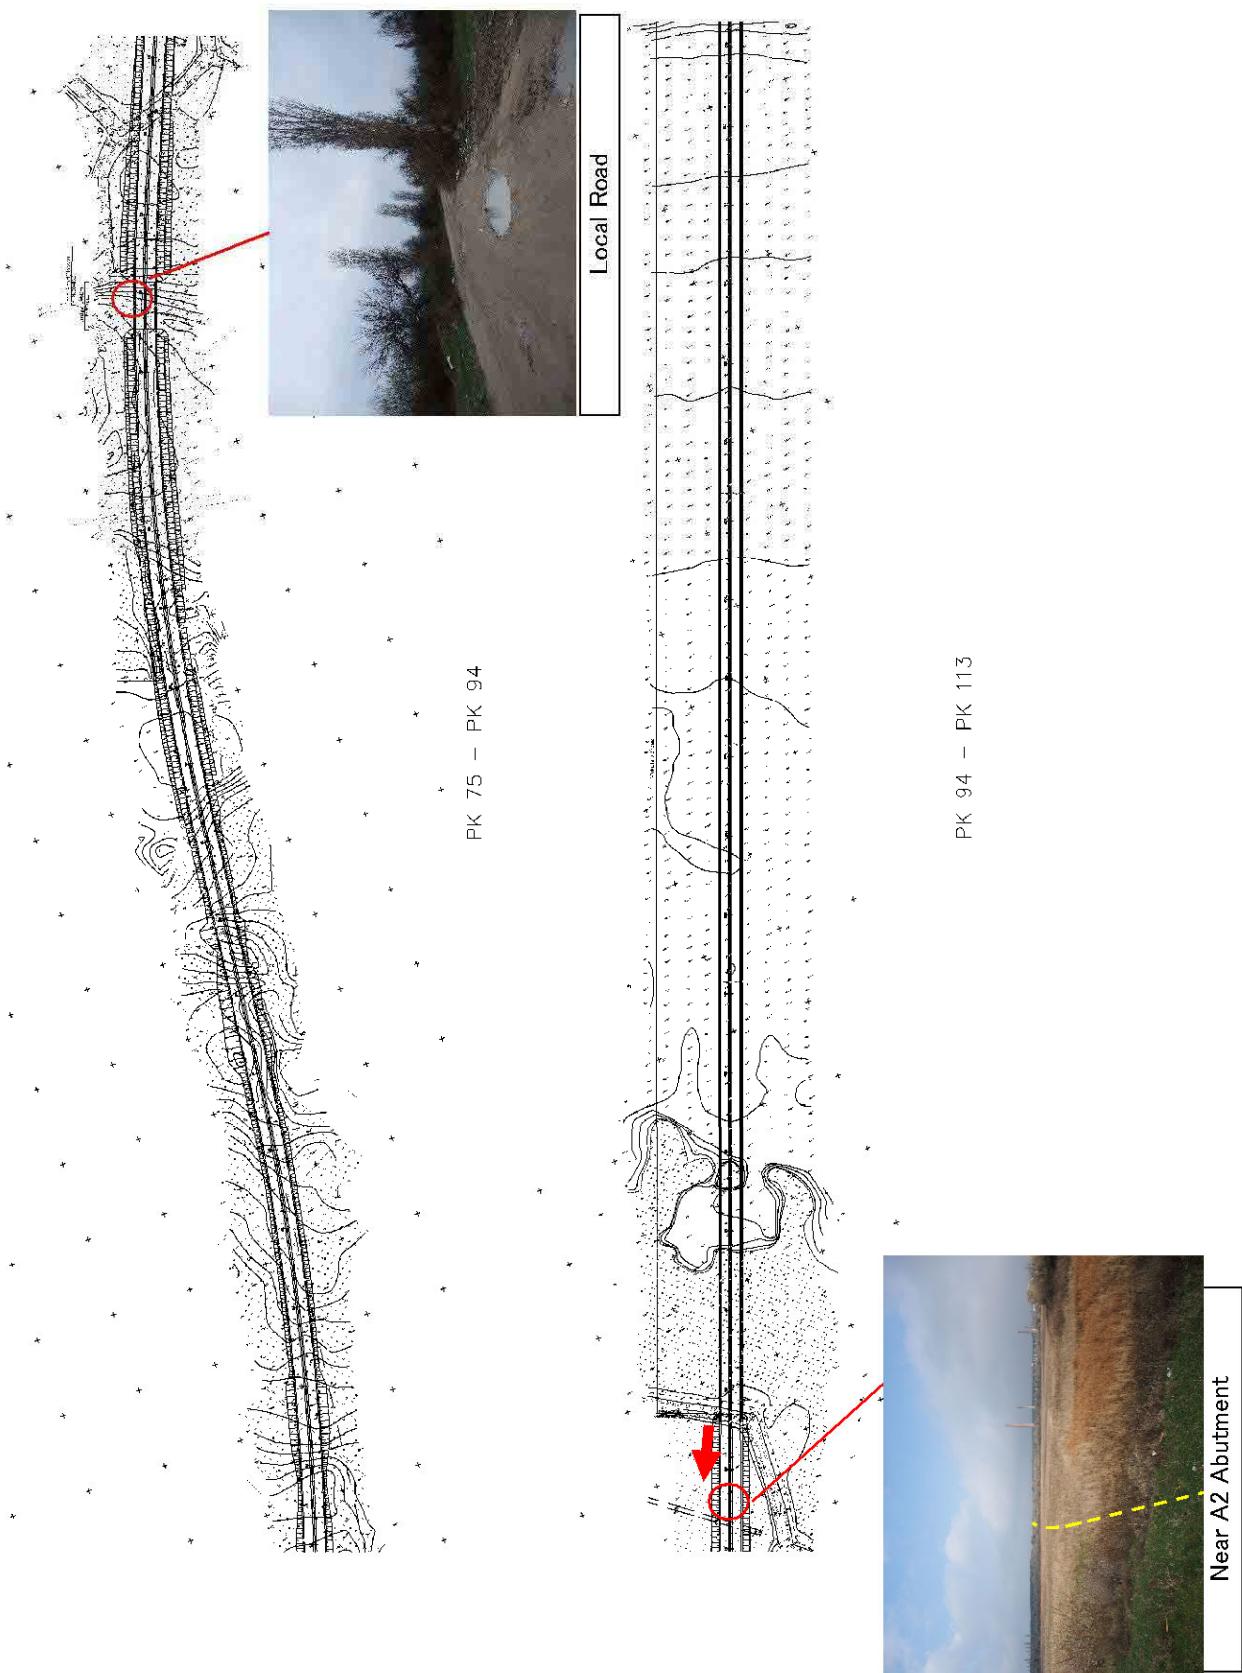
Current Site Condition of M-14 Bypass Road (3)
